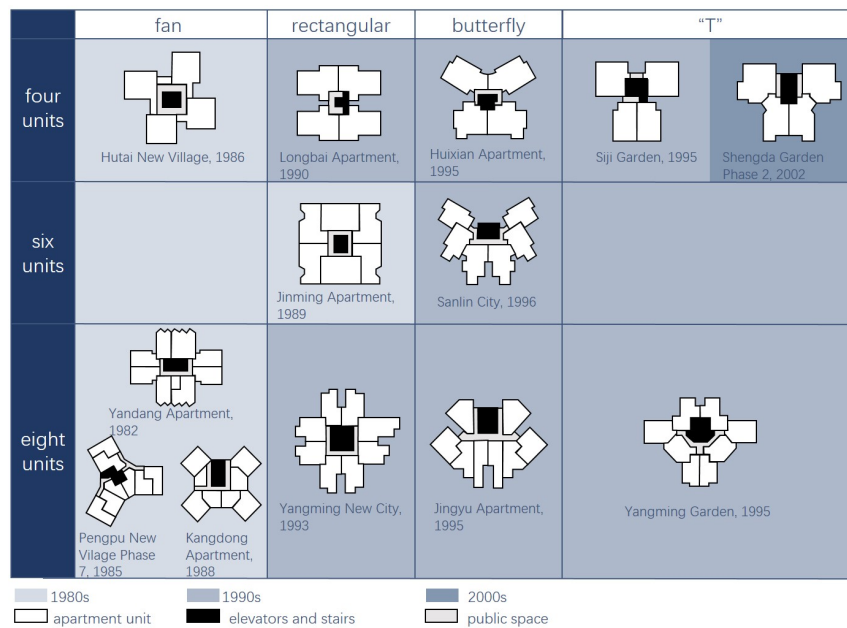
This figure shows the evolution of tower-type apartment building from 1980s to 2010s in Shanghai.
